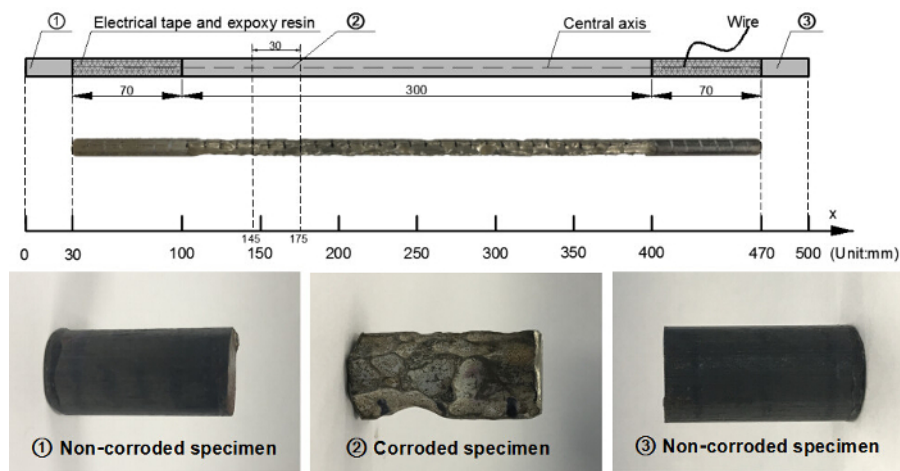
Steel bar specimen. Figure 1 shows the details of the bar specimens. Two 30 mm long end parts (1) and (3) were used as the non-corroded specimens. The 440 mm long middle part (2) was used as the corroded bar specimen. The three parts were cut from the 500 mm long steel bar at distances of 30 mm and 470 mm, respectively, from the left end of the steel bar. This figure has been modified from Figures 1 and 2 by Li, *et al.*¹⁶. [Please click here to view a larger version of this figure.](#)
